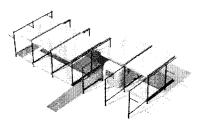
Home-Foam Structural Insulated panels used for roofing deck.
